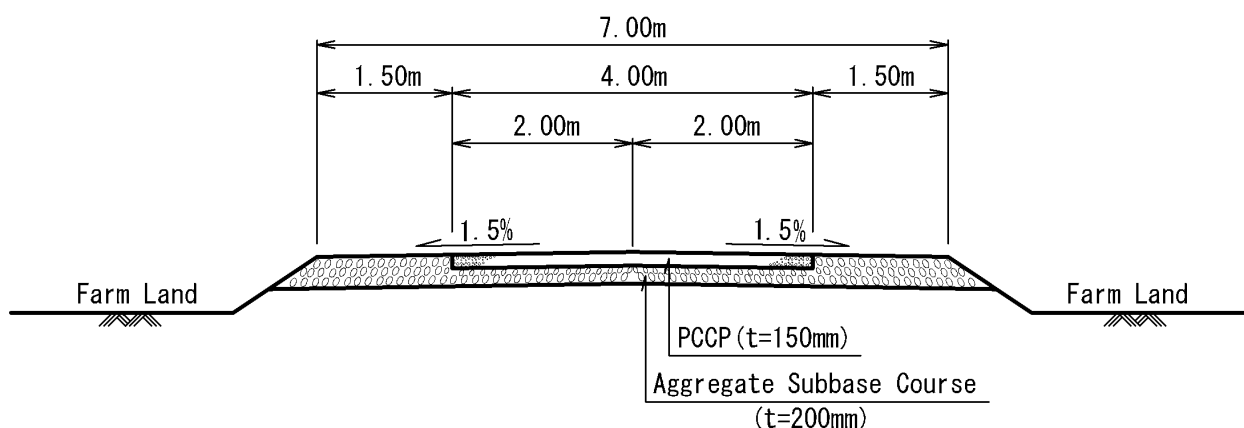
Typical Cross Section of Farm to Market Road (Access Road)
